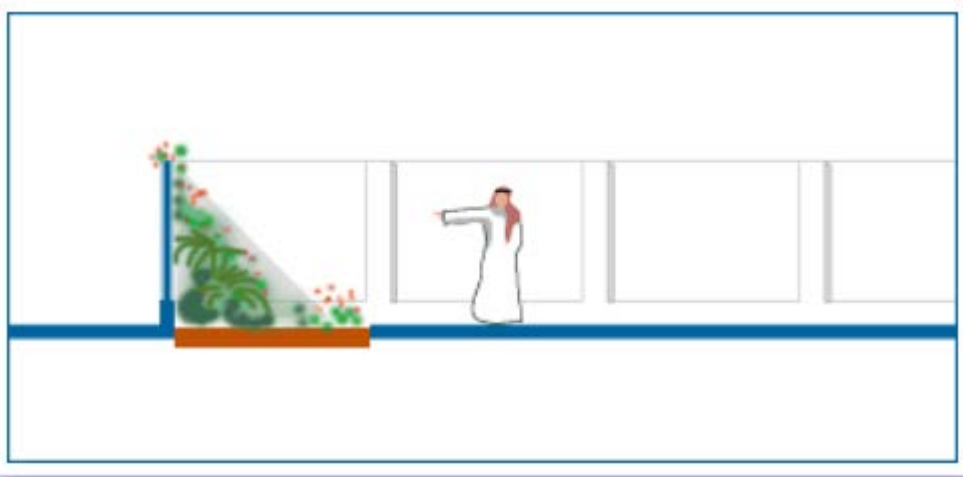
example of planting near gate (Source: Lockerbie, 2021)
